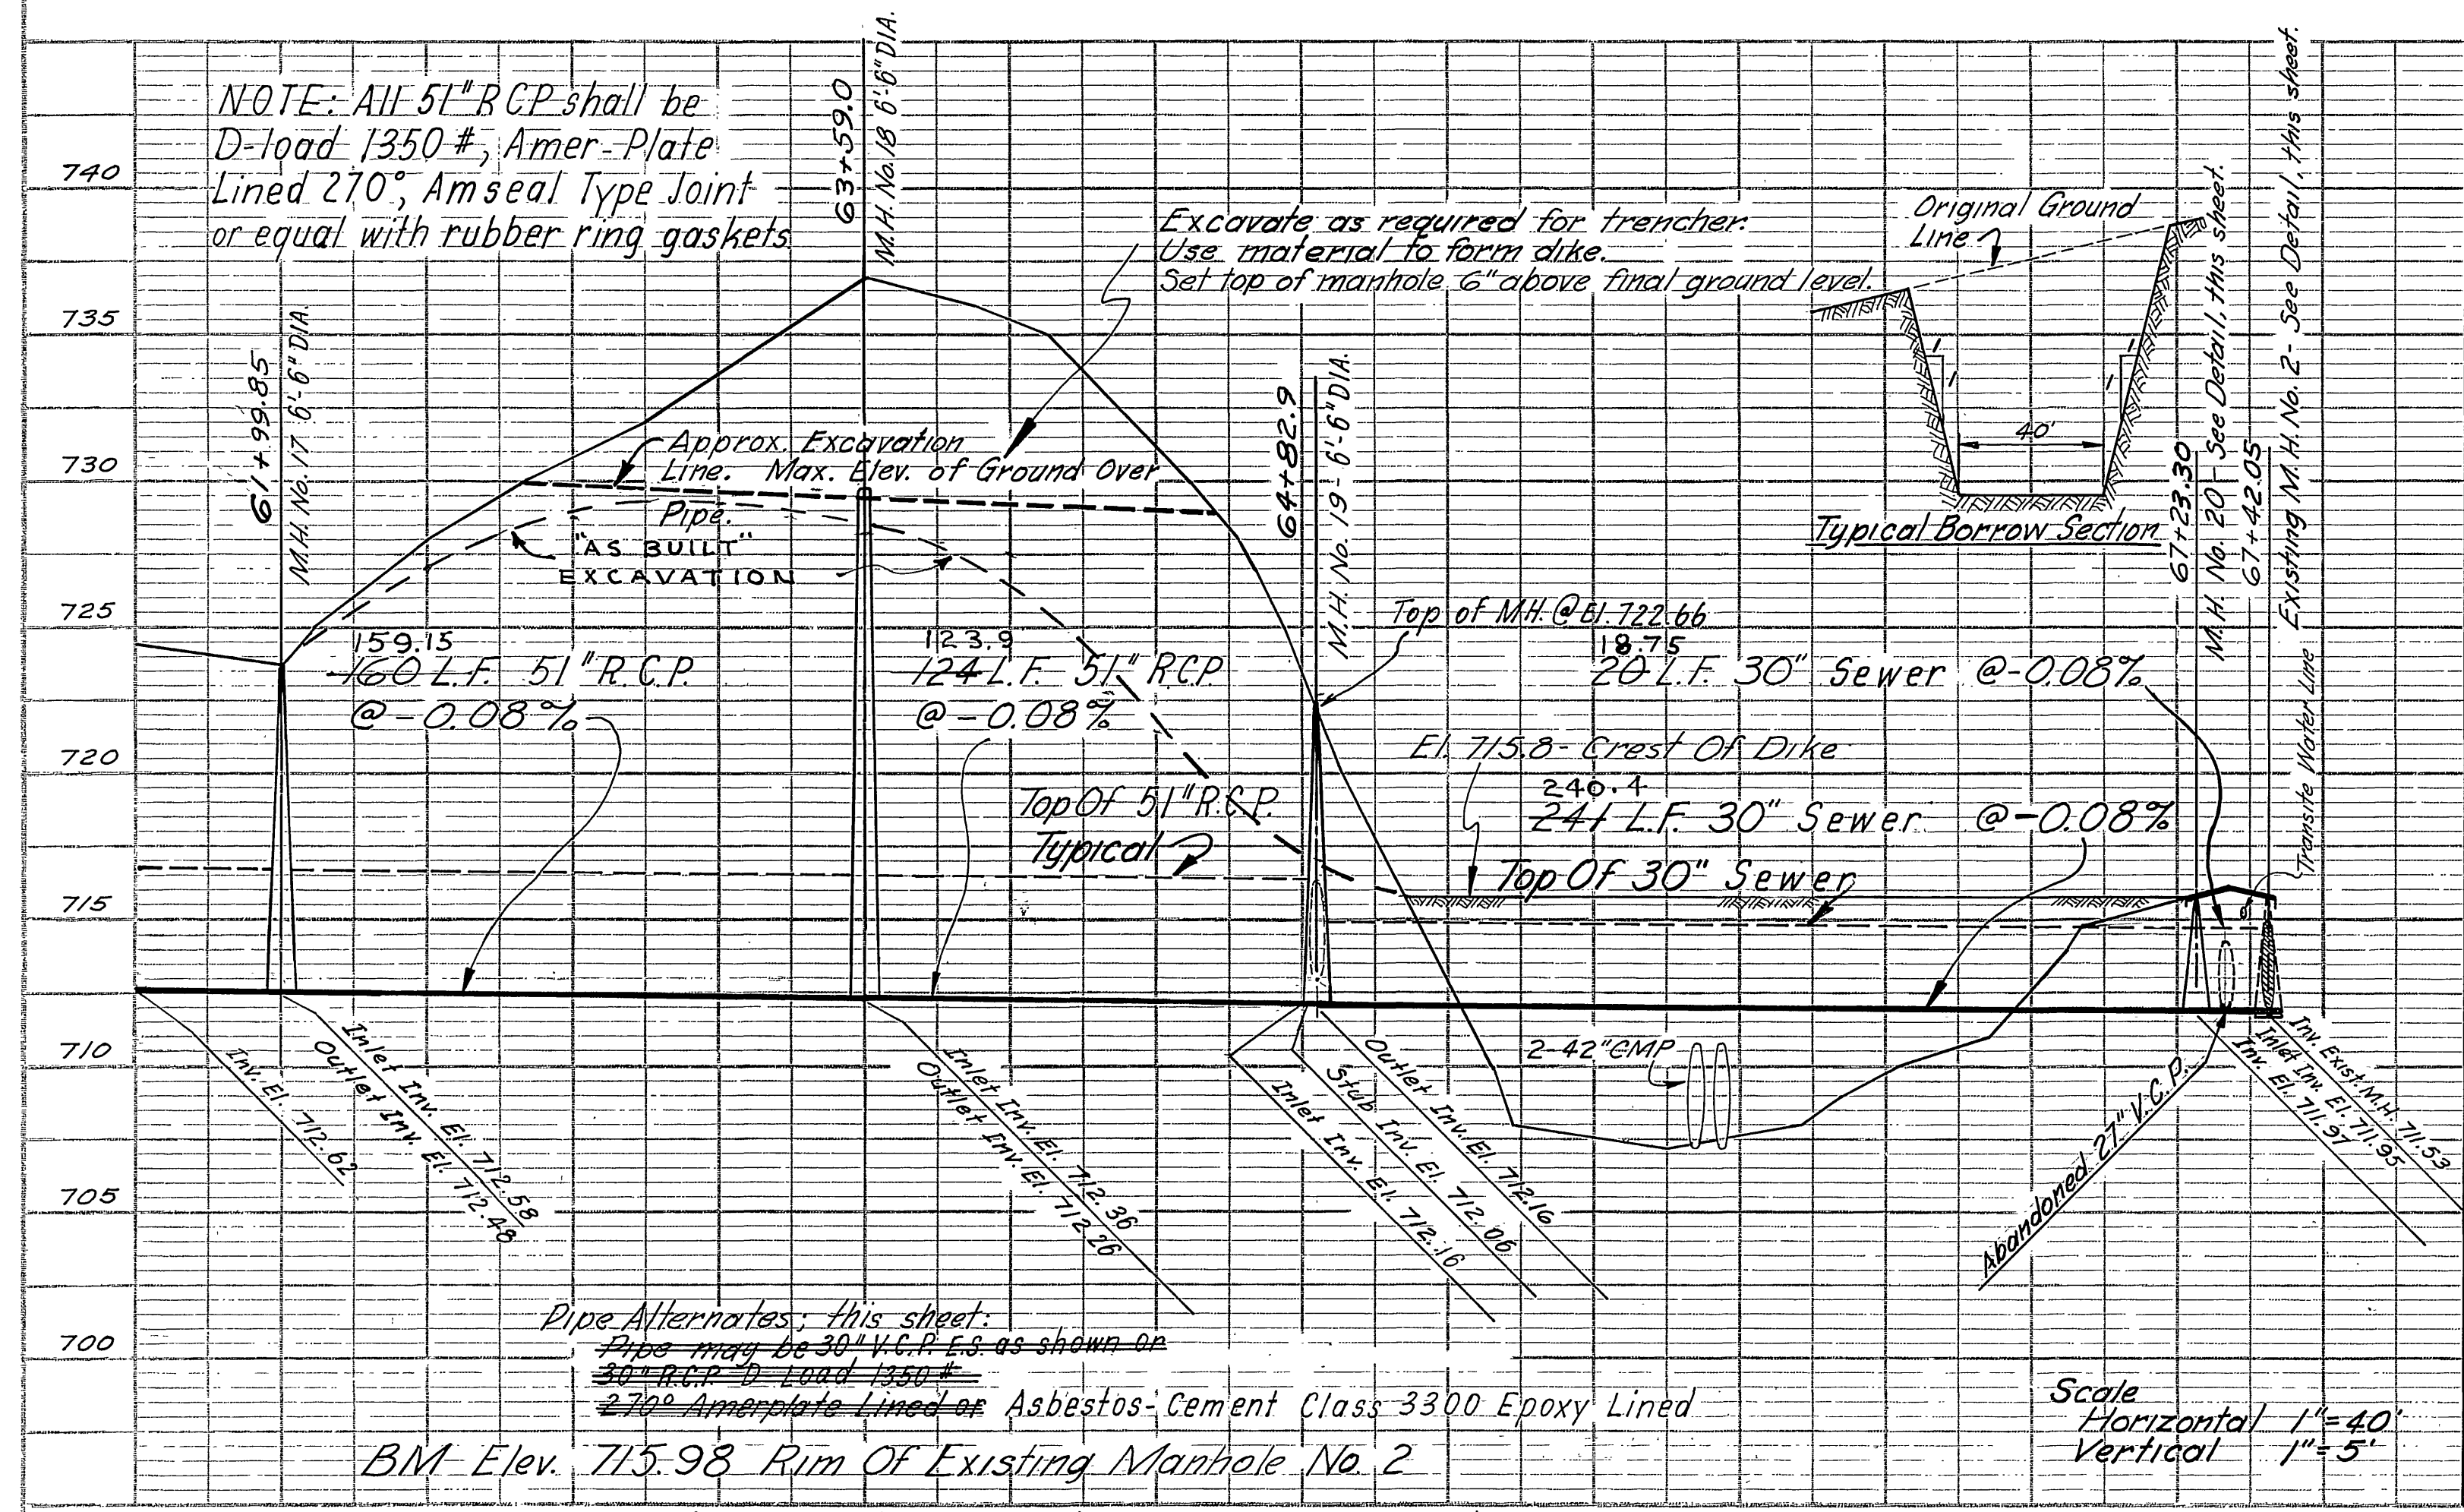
PLAN-PROFILE & P. ELEVATION
